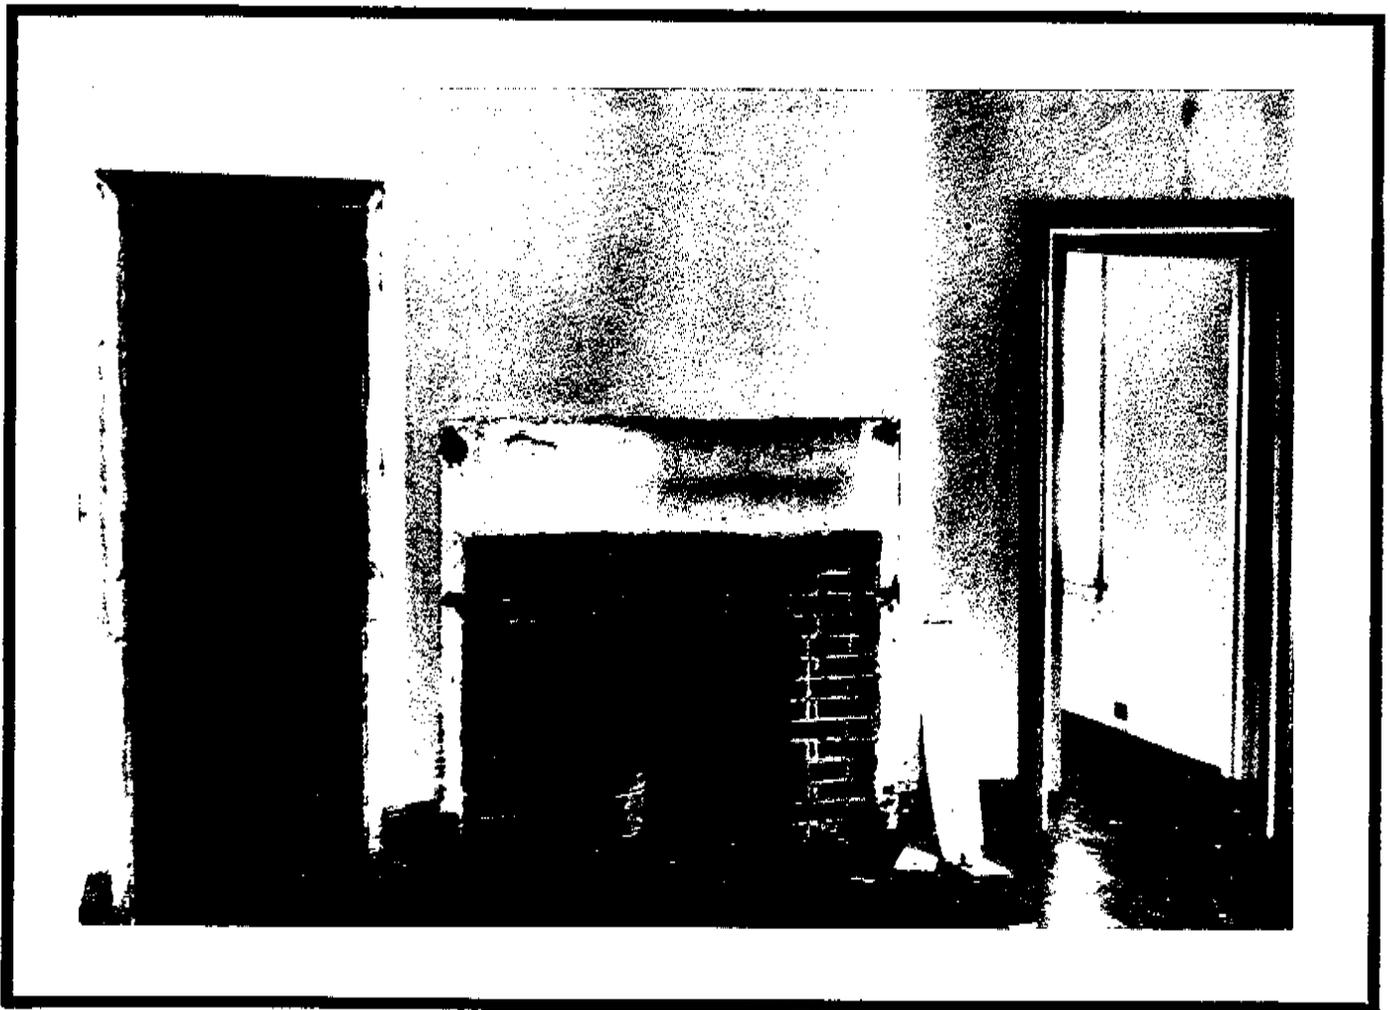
"Cottage" Farm House / Walnut Hill. Master Bedroom, View to West
